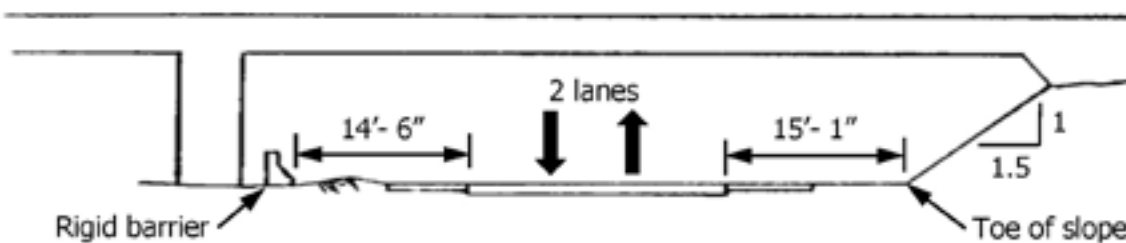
Bridge elevation view of a 2-lane, 2-way highway feature below the bridge, with a rigid barrier.
